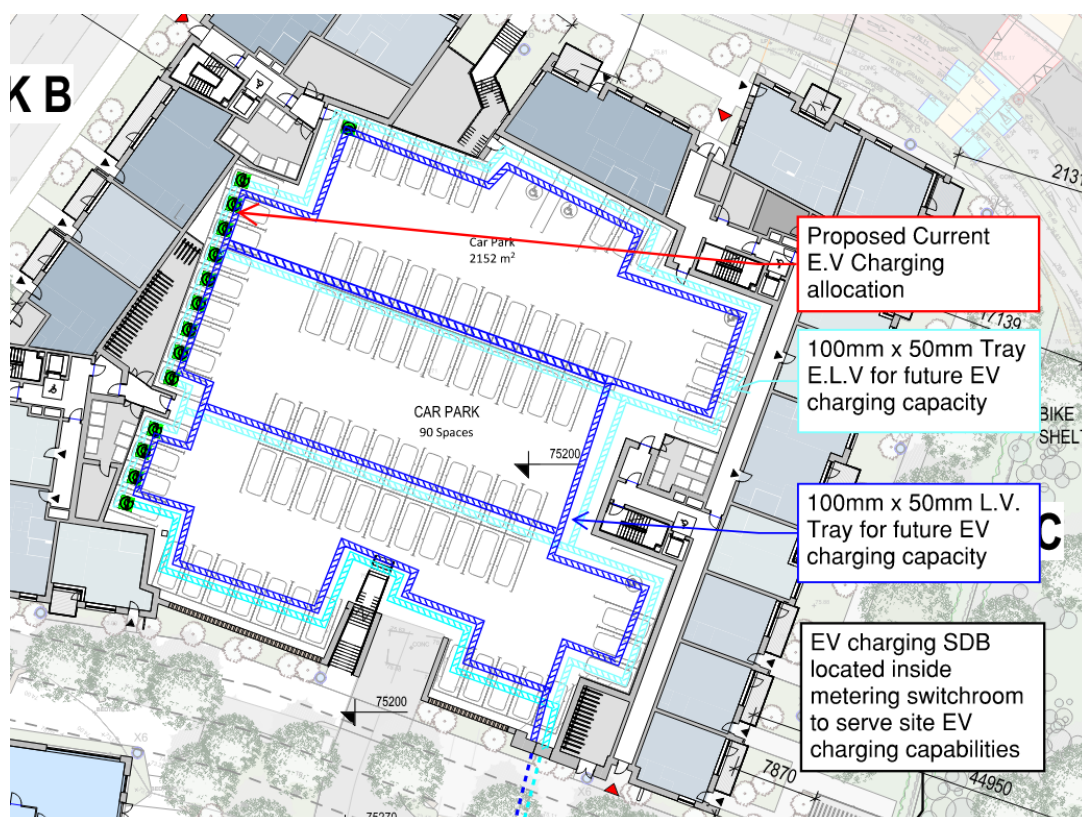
Proposed Basement Carpark EV charging infrastructure (Containment)
